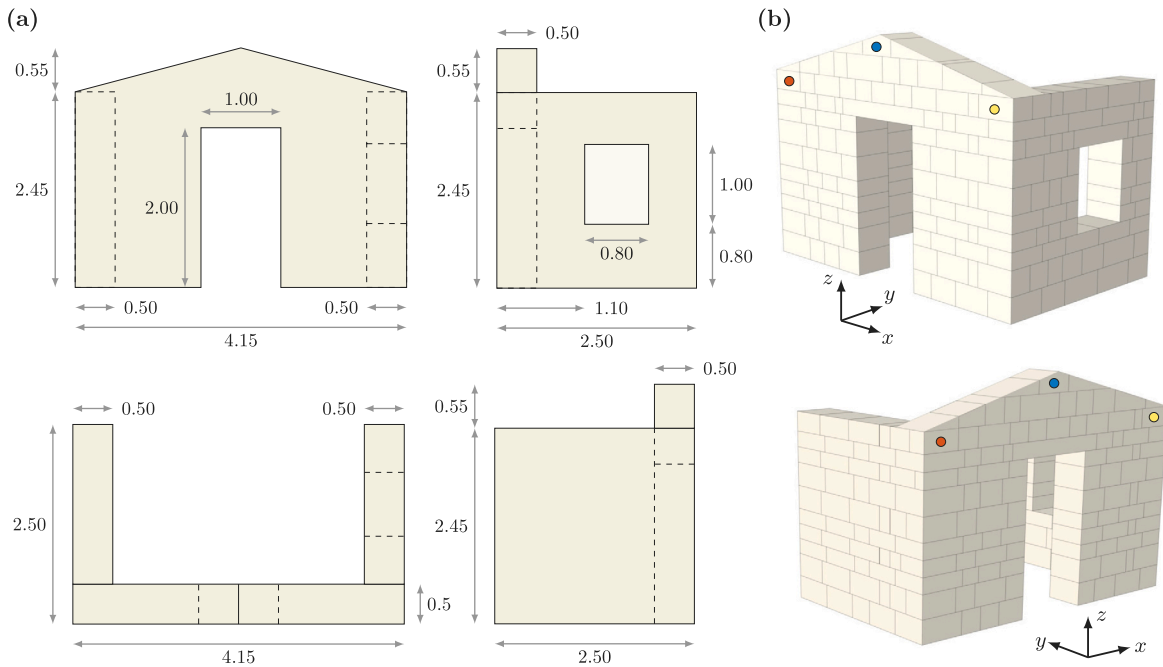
Stone house: (a) geometric model of east, north, and south walls and of layout plan (clockwise-shown, with dimensions expressed in m), and (b) perspective views of the adopted numerical model [91,92]. (For interpretation of the references to color in this figure legend, the reader is referred to the web version of this article.)
